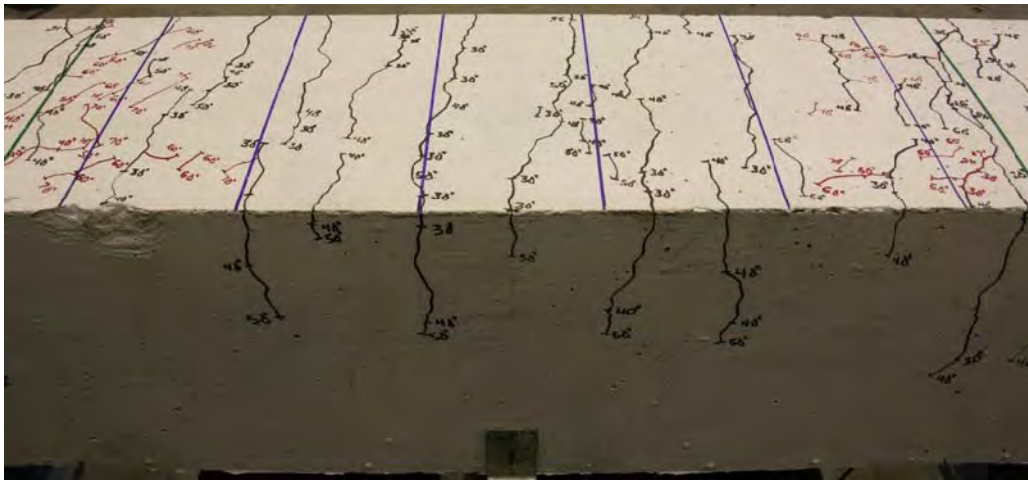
Photo. Side and top face of Beam B11-LT before failure.
